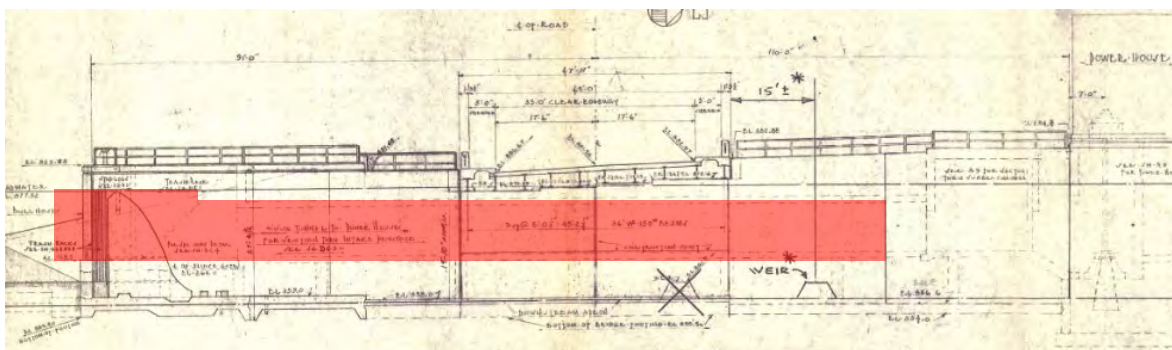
Penstock Intake and Penstock - Profile Looking Left
